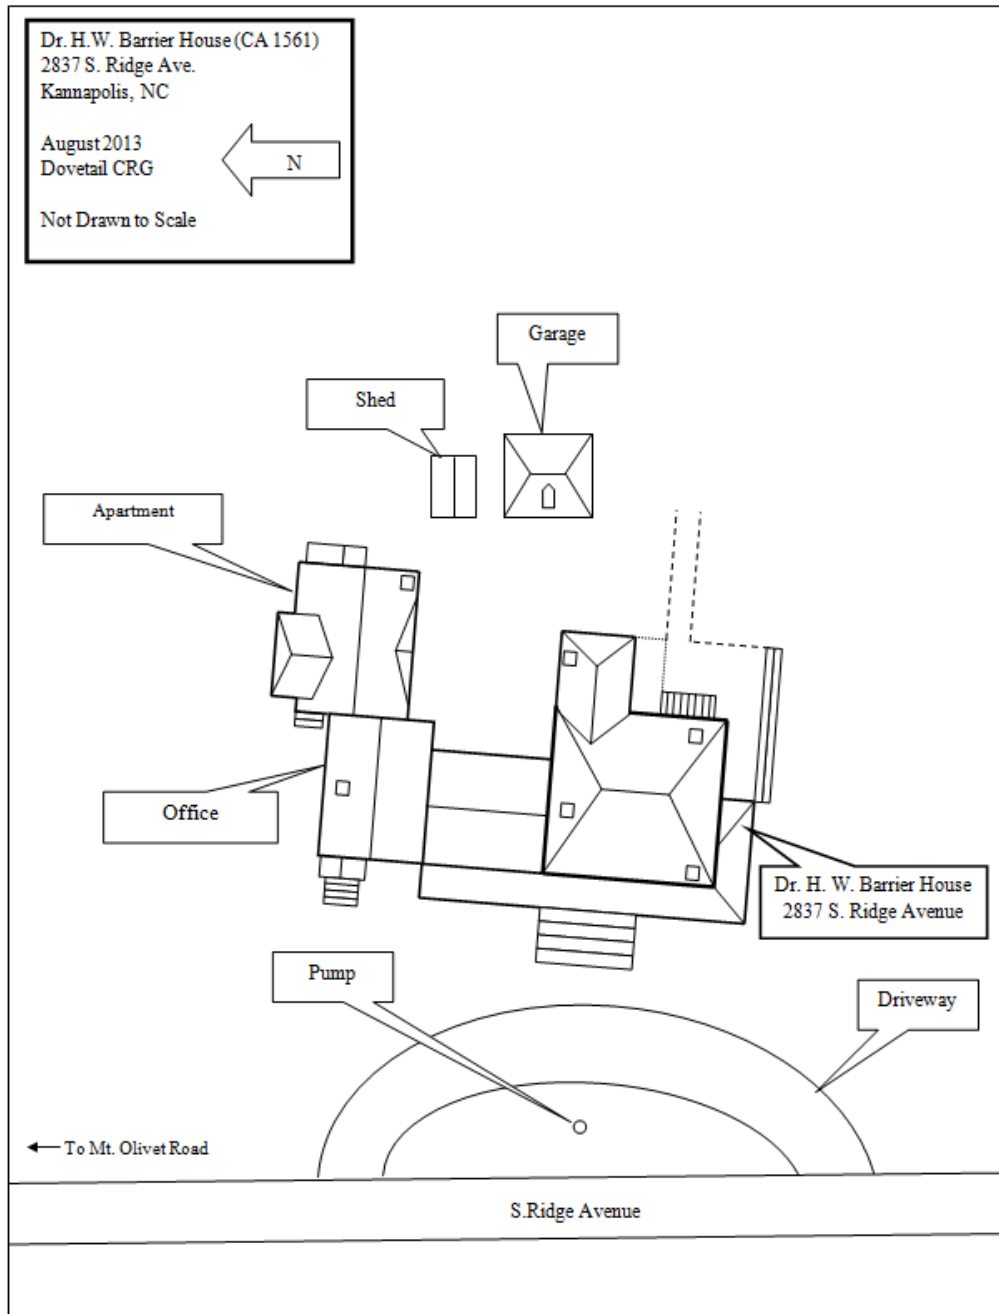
Site Plan for the Dr. H.W. Barrier House (CA 1561).
